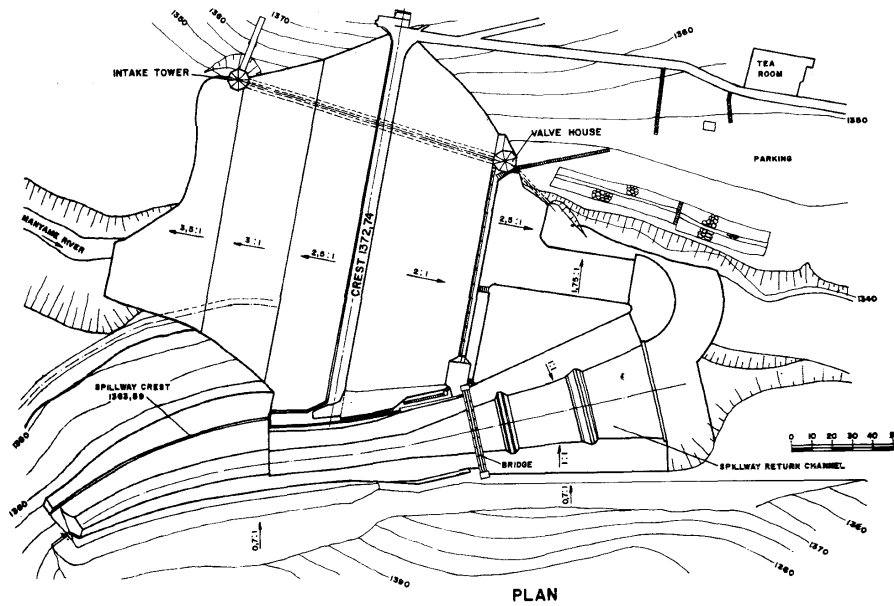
Plan of Manyame Poort Dam (Chivero Dam)
